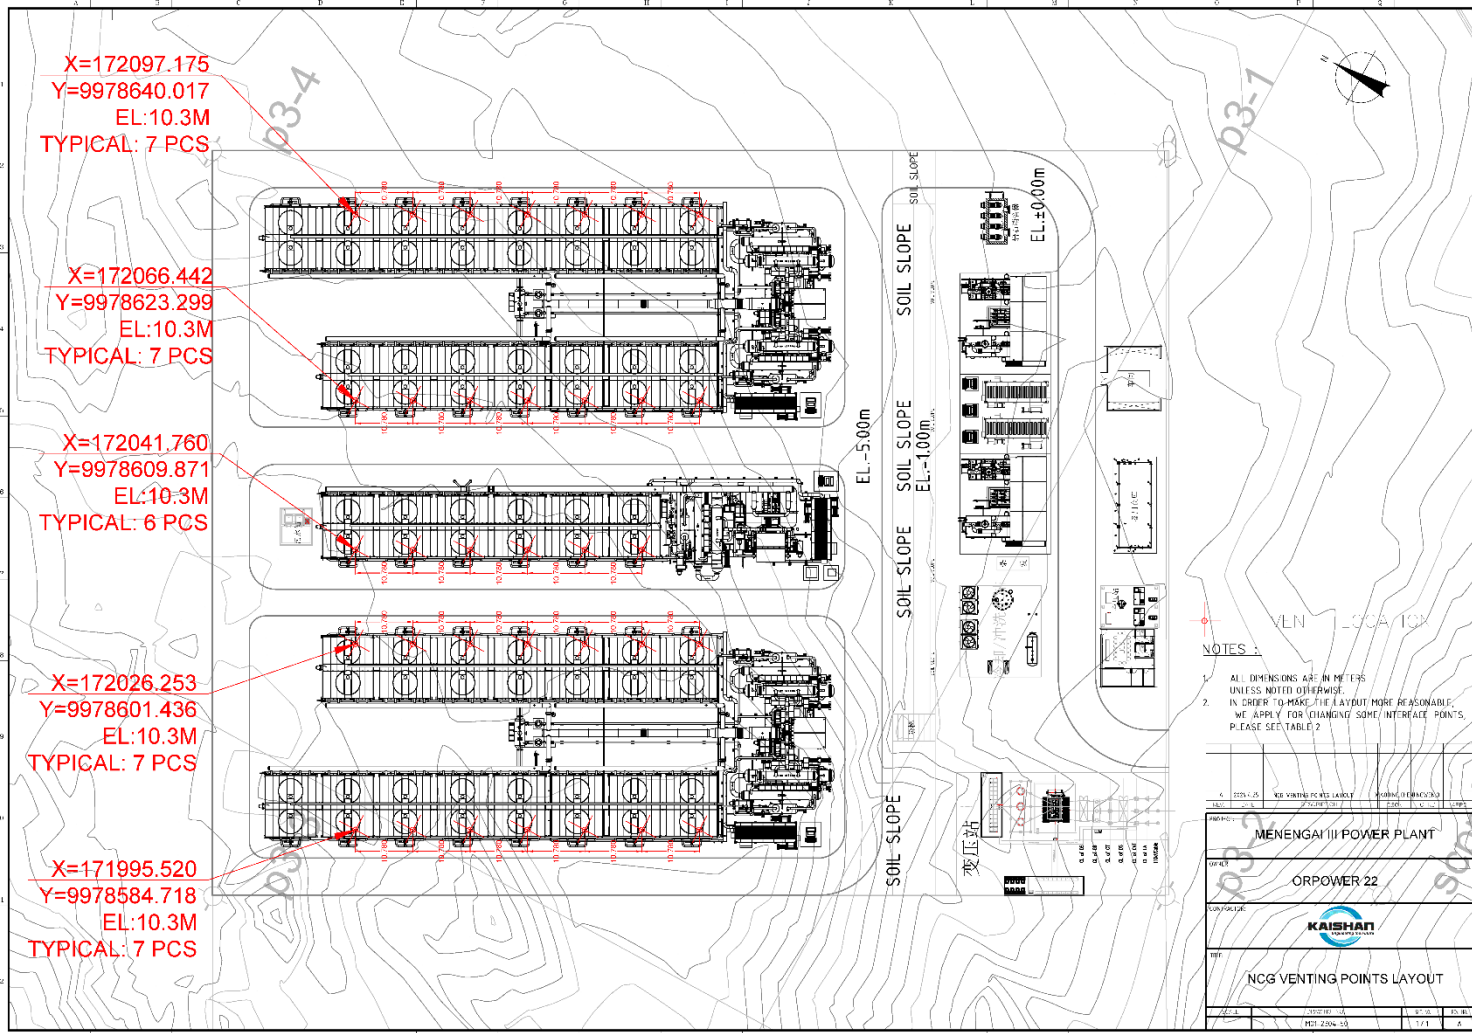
Proposed layout of the Kaishan Geothermal Power Plant (layout provided by Kaishan)
